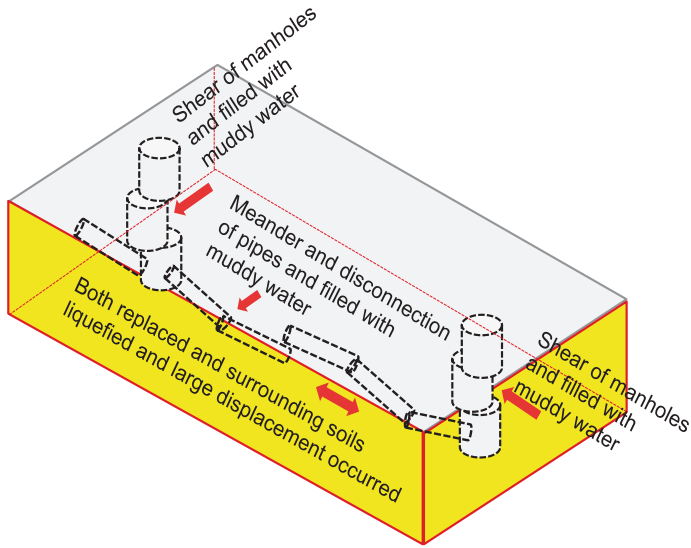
Damage to sewage pipes and manholes due to the liquefaction of replaced soils and surrounding grounds
